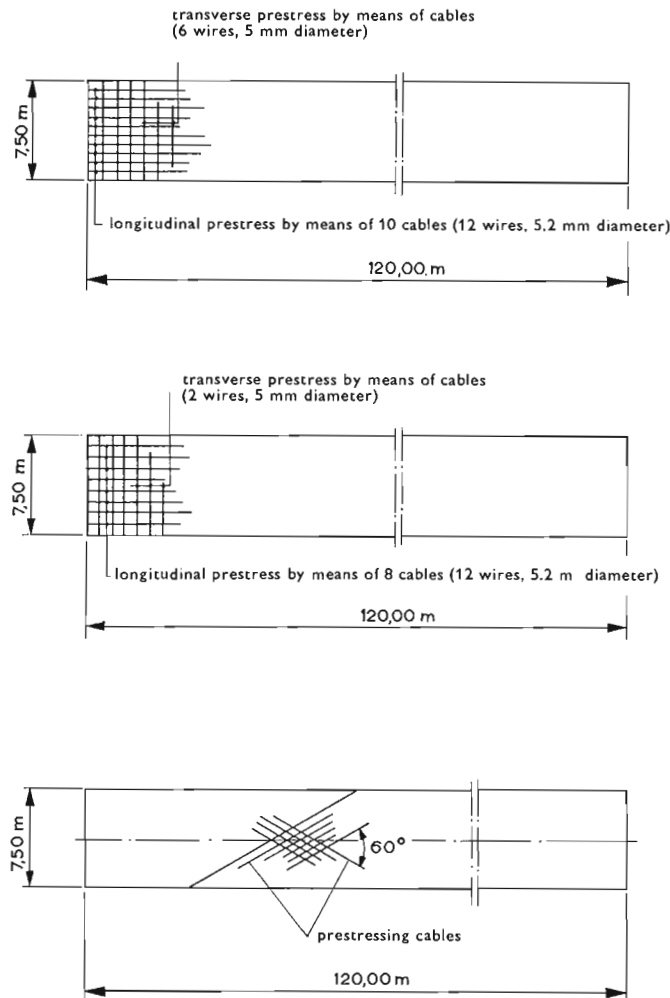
Diagrams of the prestressed concrete slabs at Mergelstetten (from top to bottom: slab I, slab II, slab III)
